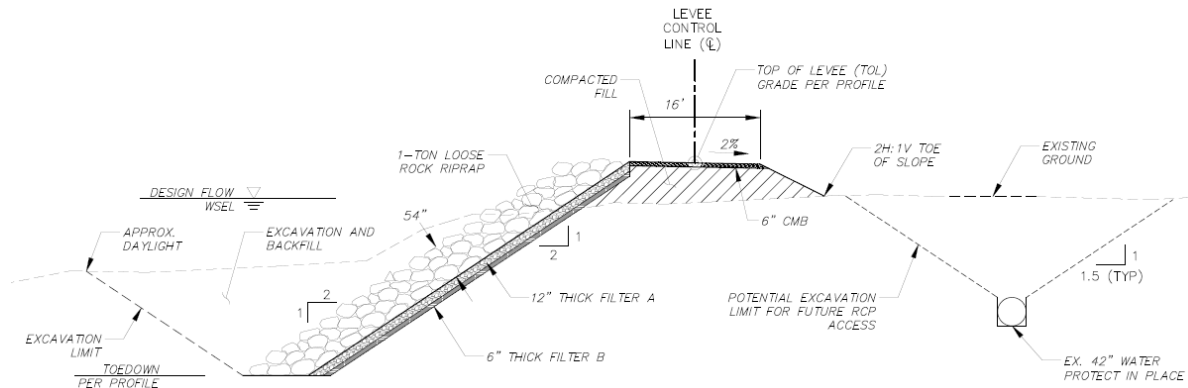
Selected Alternative Typical Loose Riprap Section (Reach II – Sta. 10+46 to Sta. 39+40)
